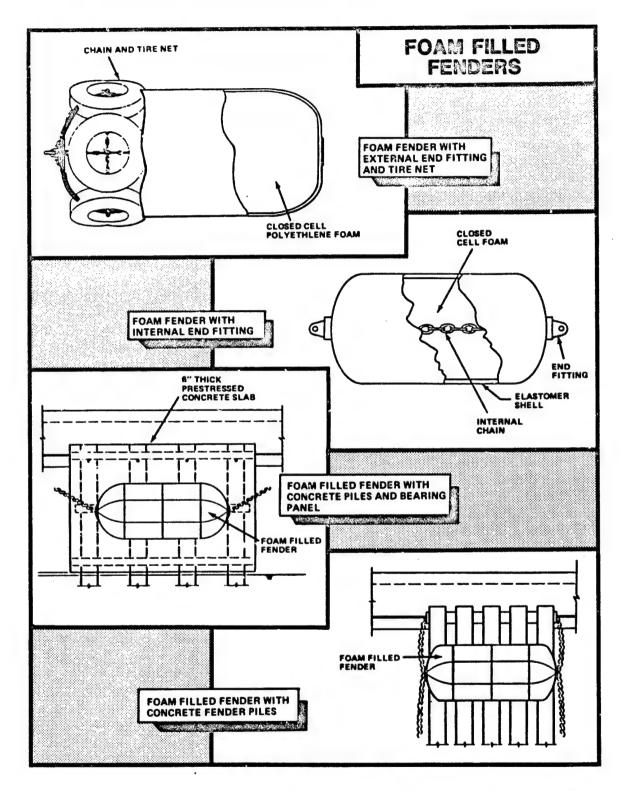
Typical Foam-Filled Fenders Used in Waterfront Berthing.
